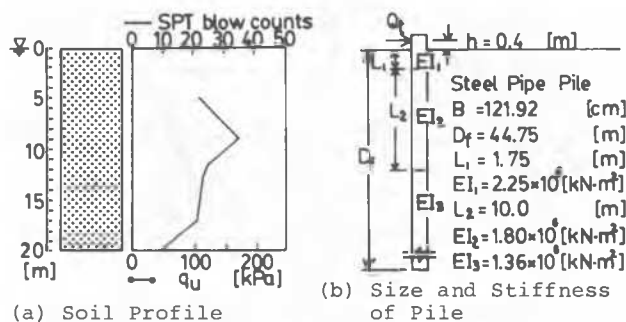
Test at Ishikari (Open-Ended Steel Pipe Pile)
